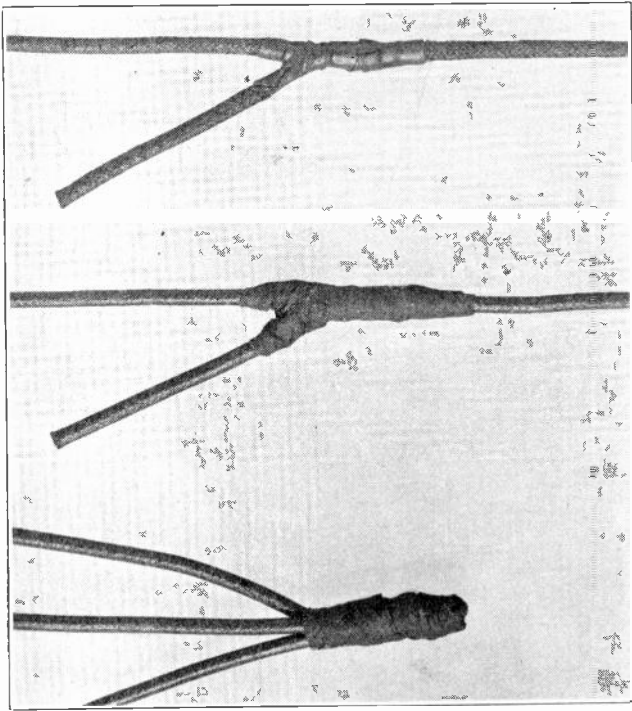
The upper view shows a "tap" splice covered with rubber tape. The center and lower views show "tap" and "pigtail" splices completely taped with both rubber and friction tape.
